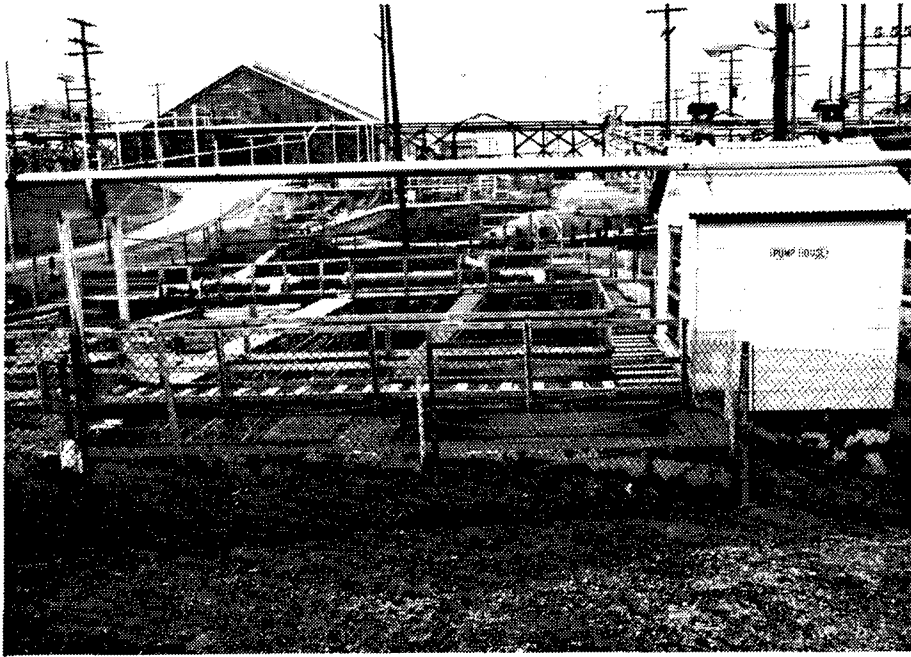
Building 1020: Boiling Tub Settling Pit and Pump House.
